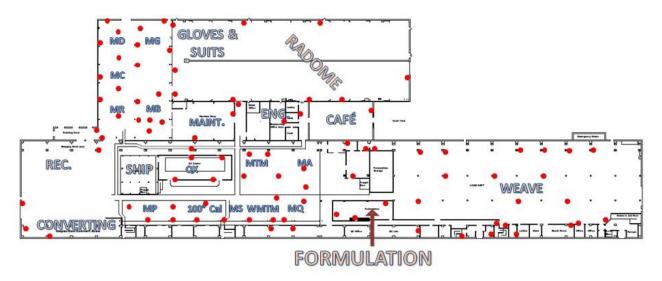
C – Fire Extinguishers (1<sup>st</sup> Floor)
